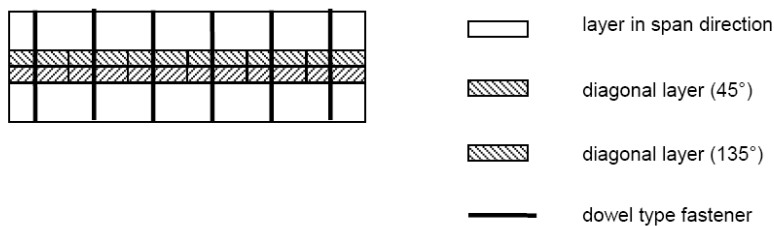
Principle structures of the solid wood slab element – element of dowel jointed timber boards
